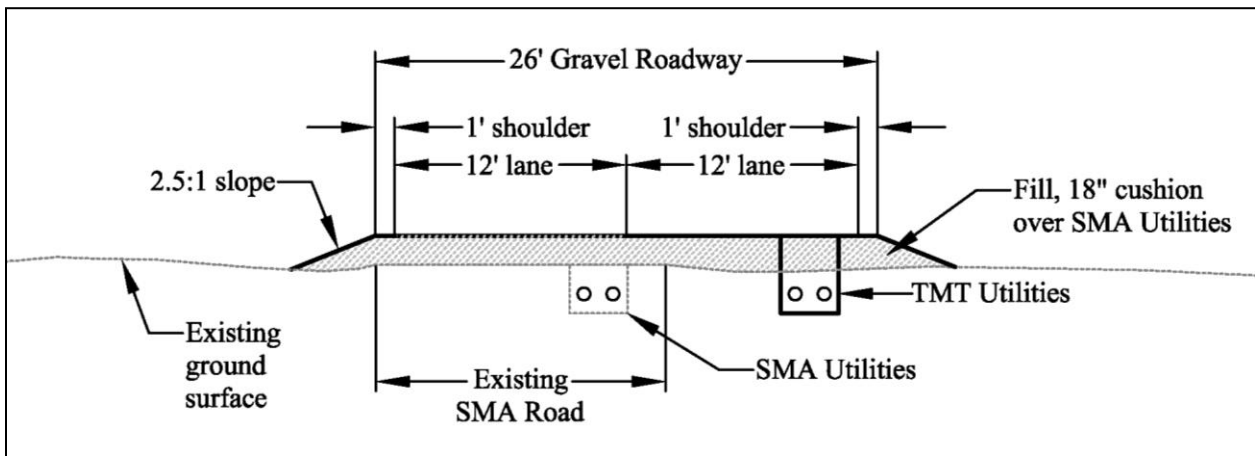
General Cross Section of Access Way in Lava Flow Section Overlapping SMA Road
